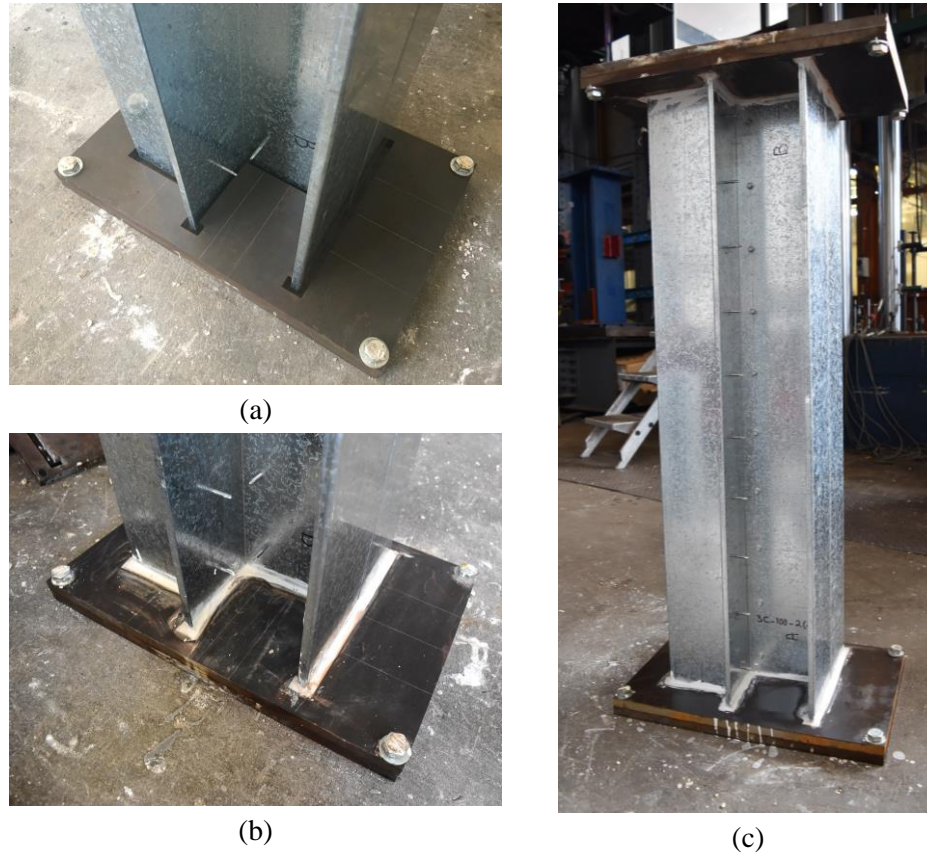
Process of preparing a specimen for testing: (a) alignment of the specimen, (b) pouring Patternstone for the first end, (c) final specimen
